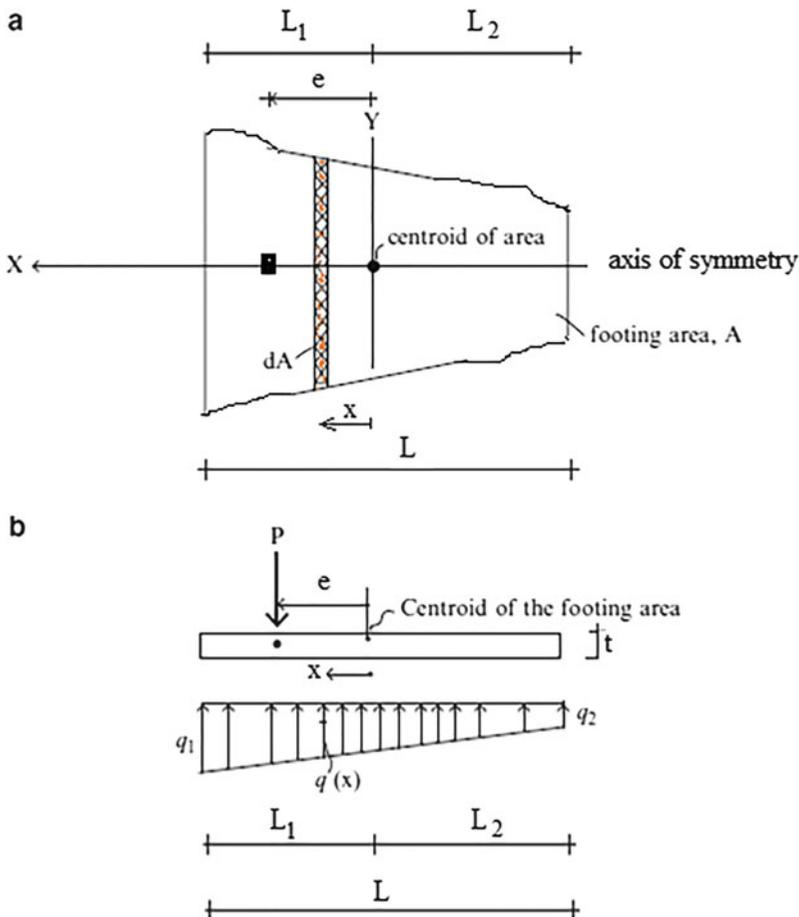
Notation—pressure distribution—single footing. (a) Plan. (b) Elevation
